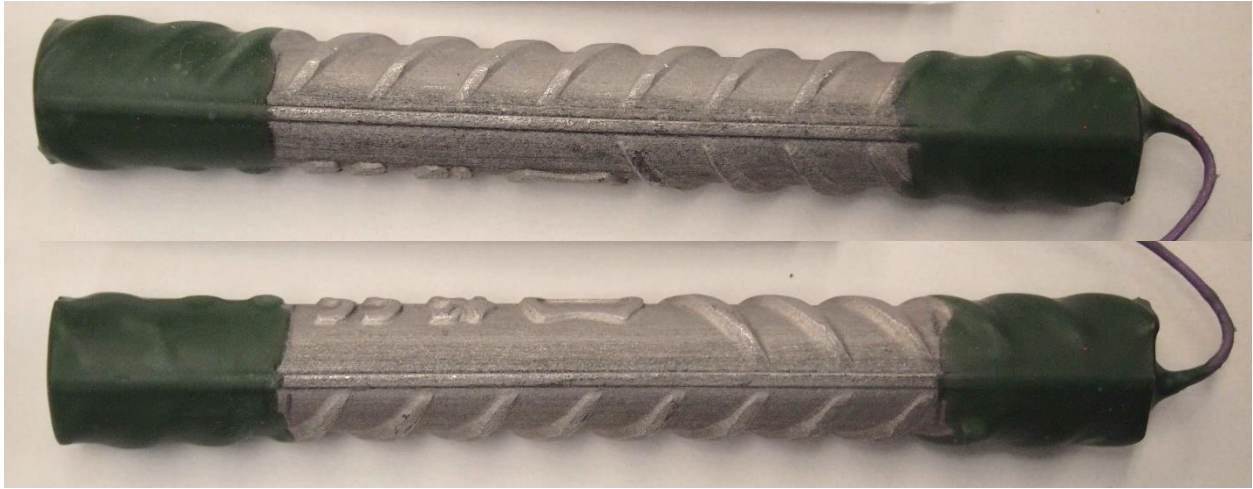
Specimen PKSB-05 before testing (top) and after testing (bottom)
